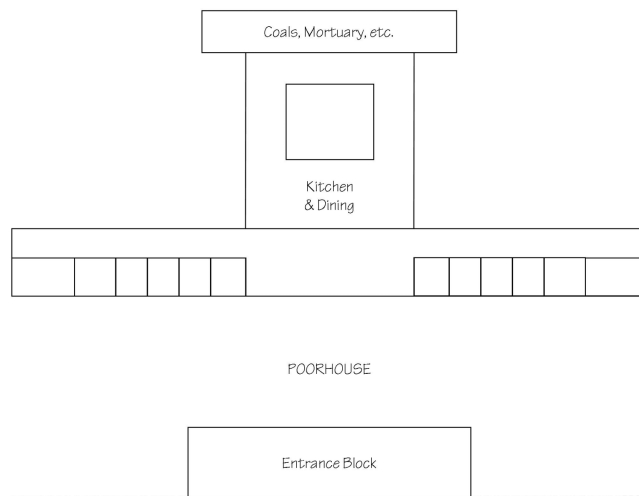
Sketch plan of Poorhouse layout (Darragh, 2011a:222)²¹⁰
